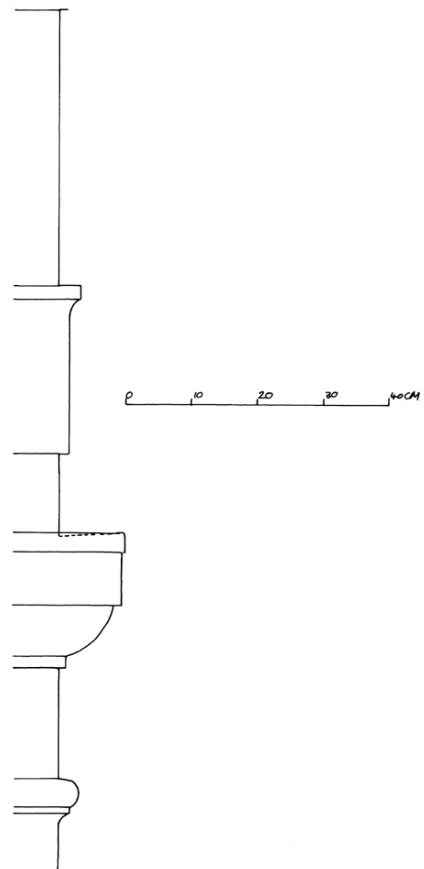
The Orangery wall, the moulding at the top of pilaster 7.
